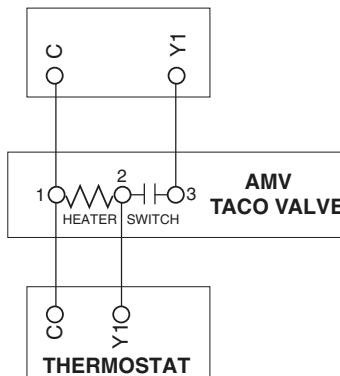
Typical Aquazone Accessory Wiring (Control D Shown)
